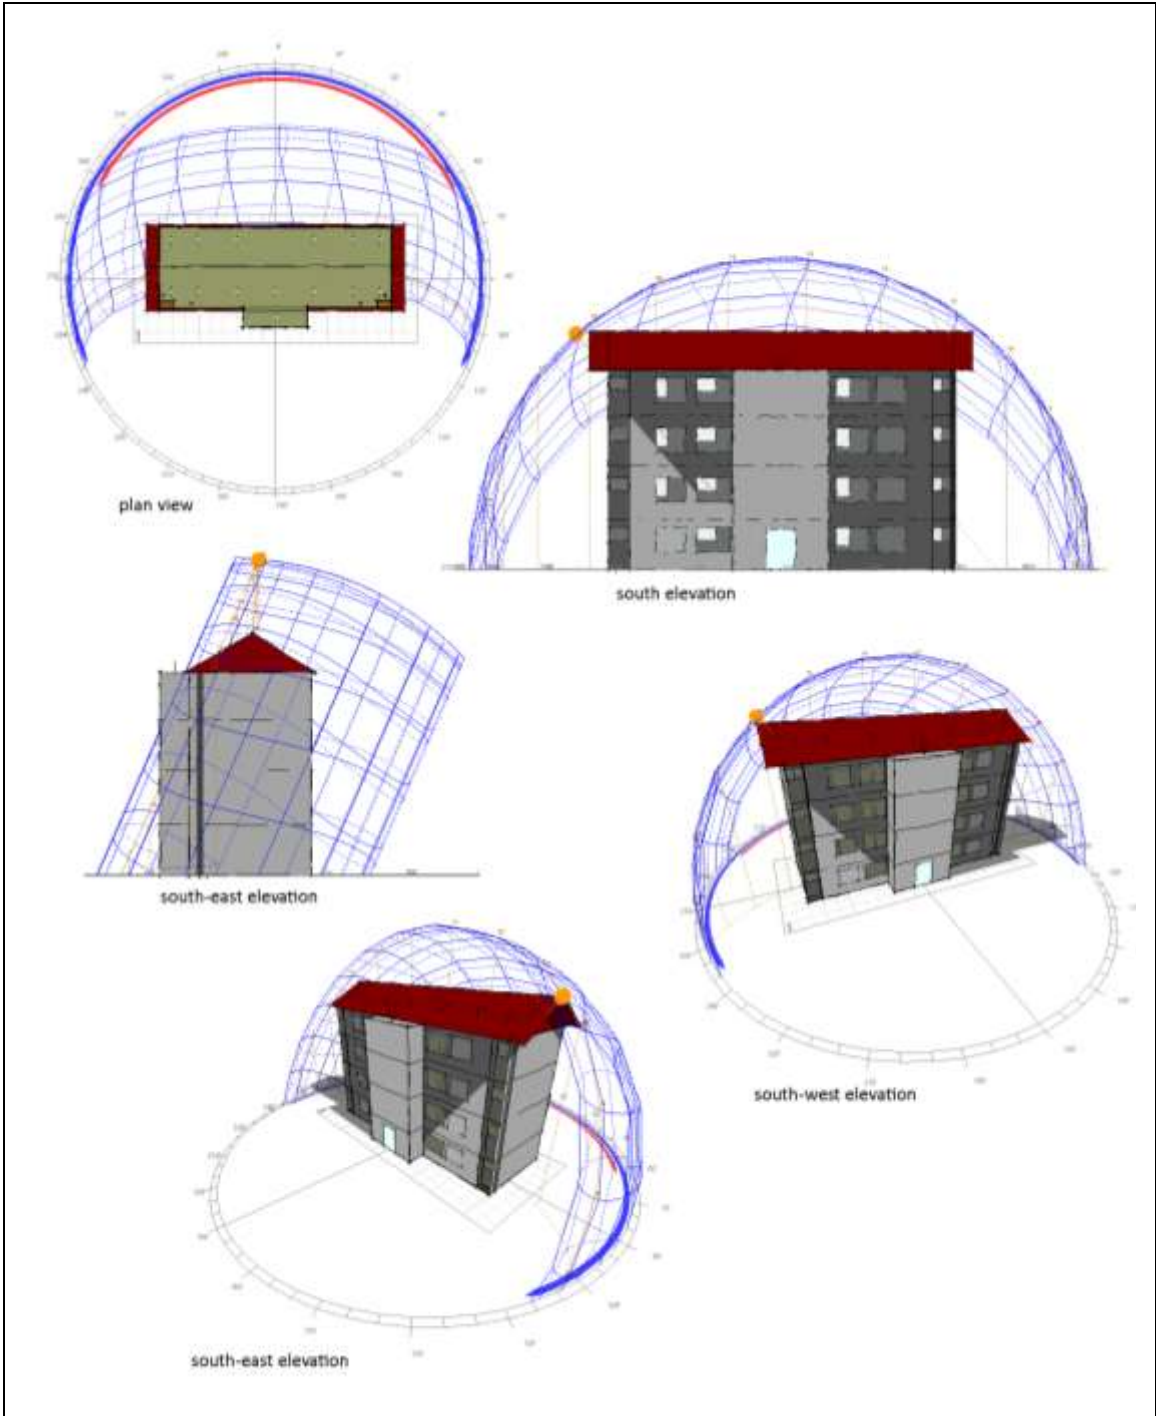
Voith building – extension of east and west sides of the roof. Image source: Ecotect 5.5.
